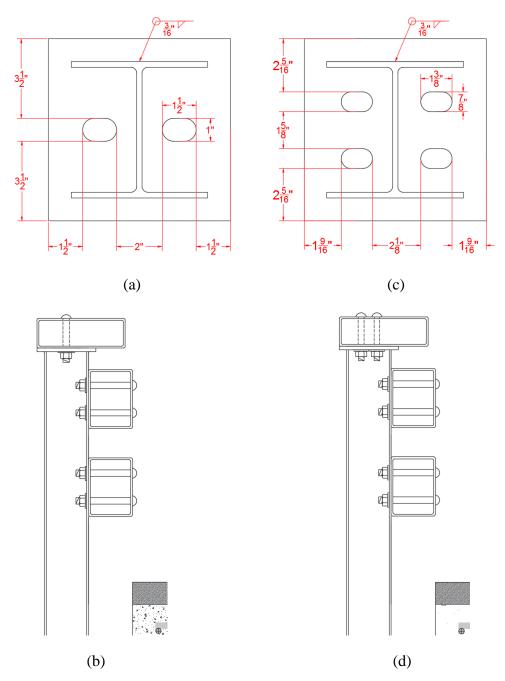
Top Rail Fully-Welded Plate Concept - (a) Plan View Option 1 without Top Rail, (b) Side View Option 1, (c) Plan View Option 2 without Top Rail, and (d) Side View Option 2
